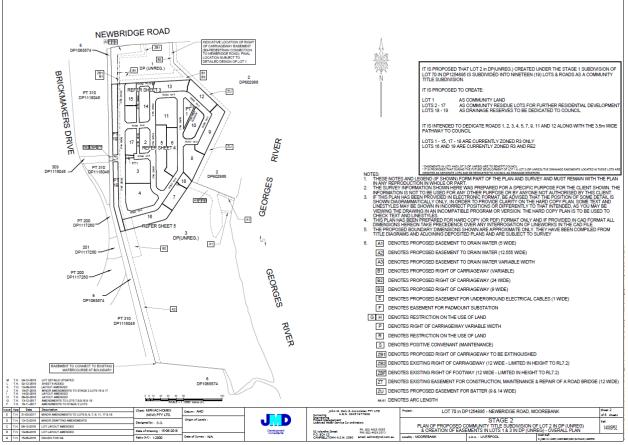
Nineteen (19) lot subdivision in Stage 2 of subdivision of 146 Newbridge Road, Moorebank
